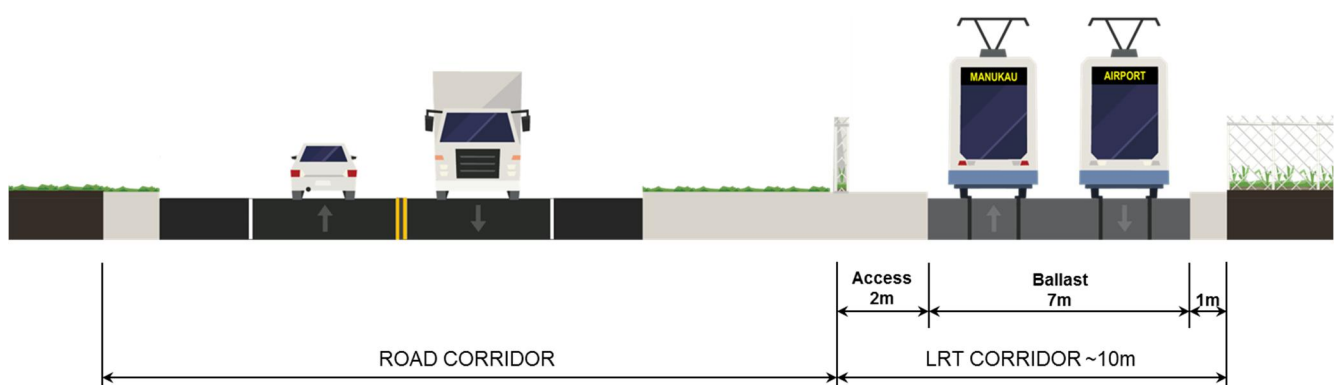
SH20B Puhinui Road: Airport to SH20B - typical cross section
